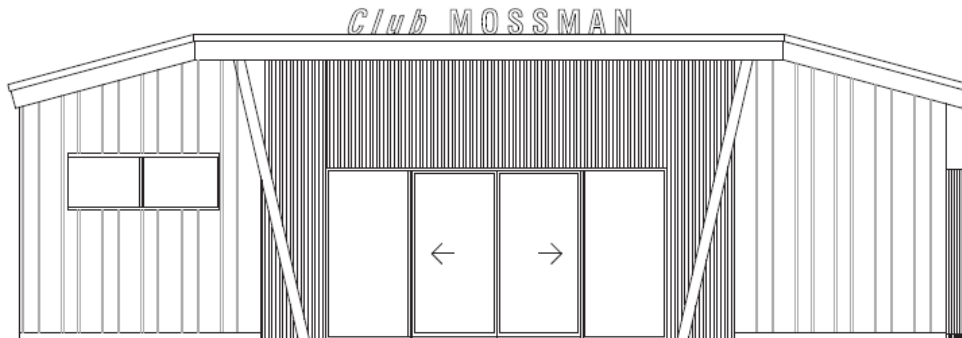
Front Elevation – B&W Signage Sketch (in isolated context)
